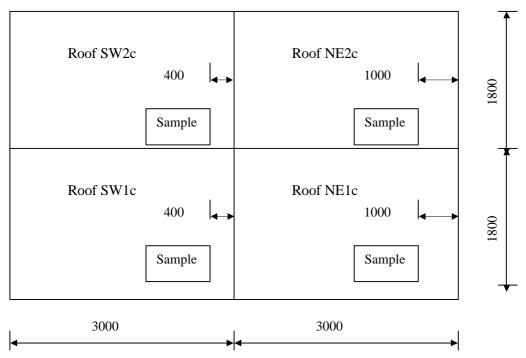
The location of the collected large zinc specimens in the cold zinc roofs (top view)
